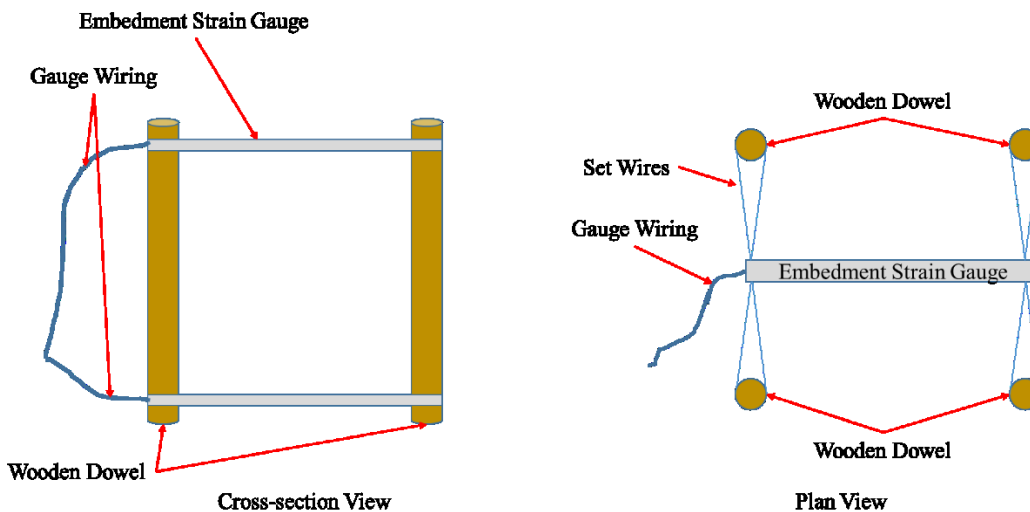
Schematic of concrete dynamic load strain gauge used in MnROAD 2017 construction.
